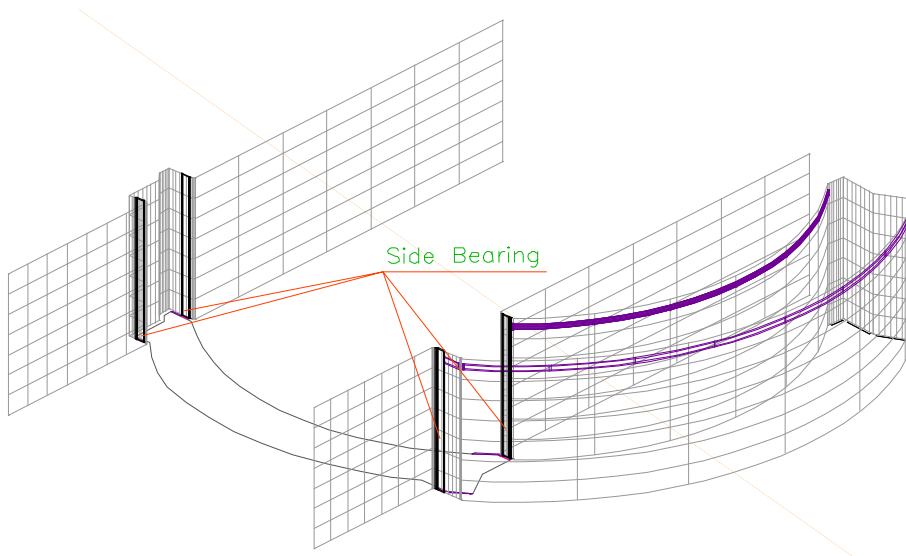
3D-view, Location of side bearings panels on lock head
